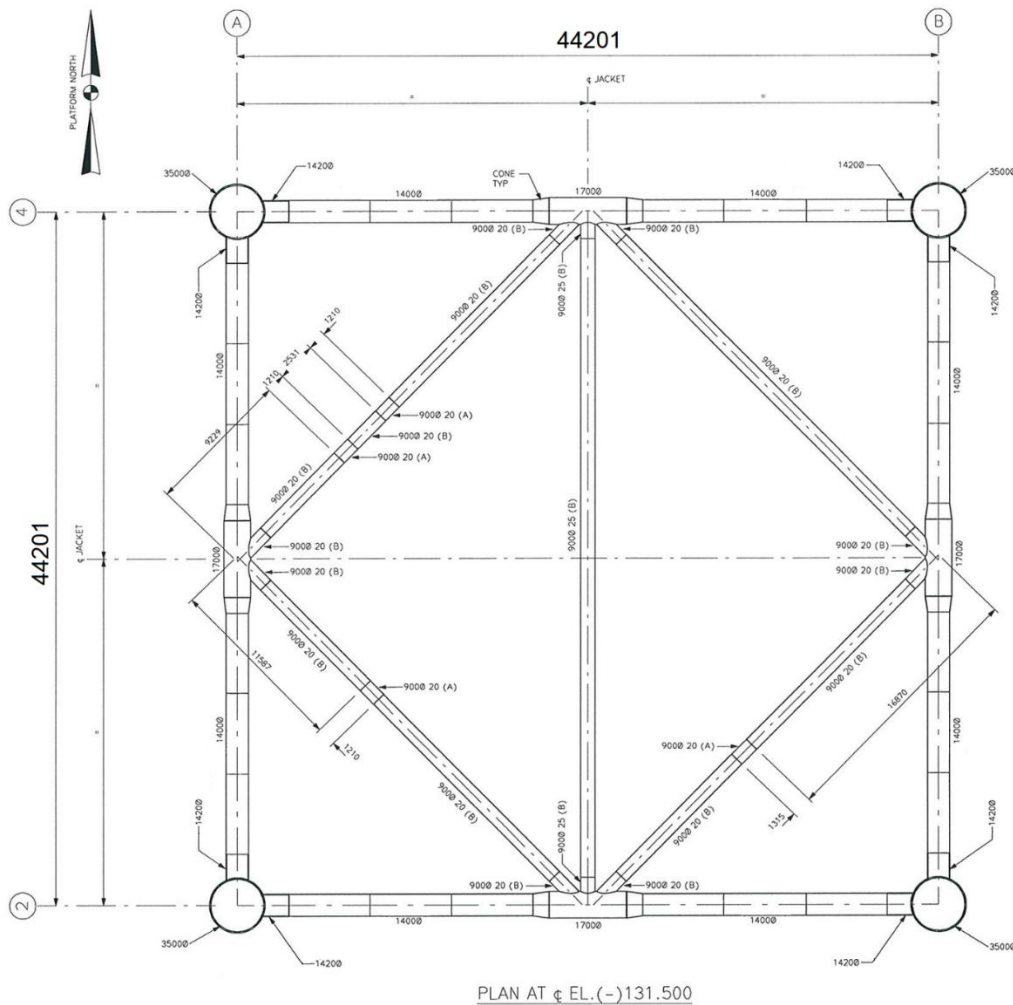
Solon jacket bracing plan at EL. -131.500
